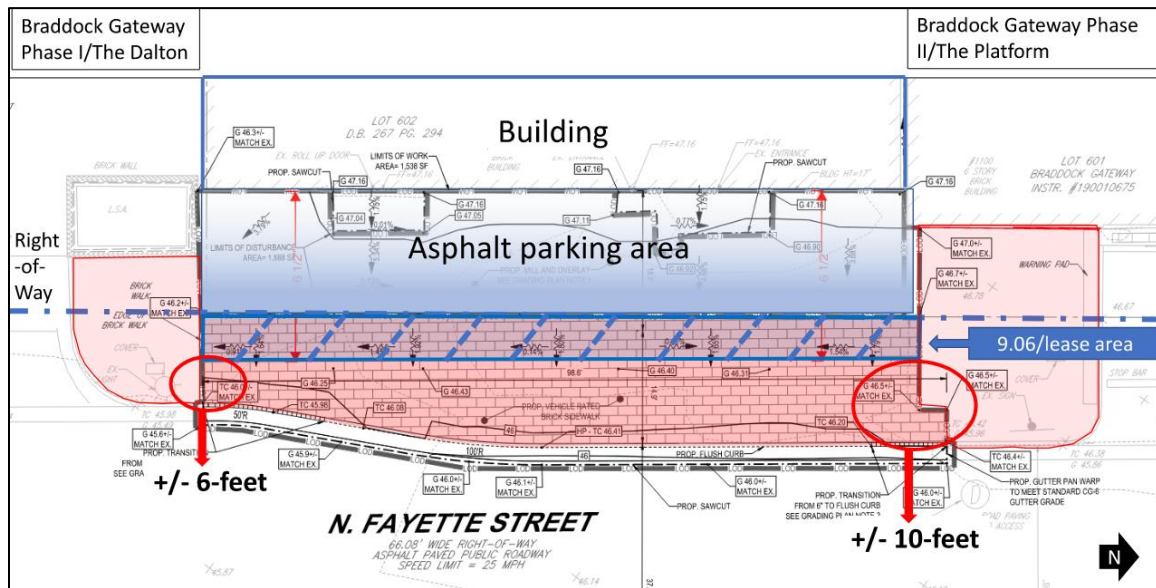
Right-of-way in front of Yates building show brick sidewalk (pink) and 9.06/lease area (diagonal overlay)
